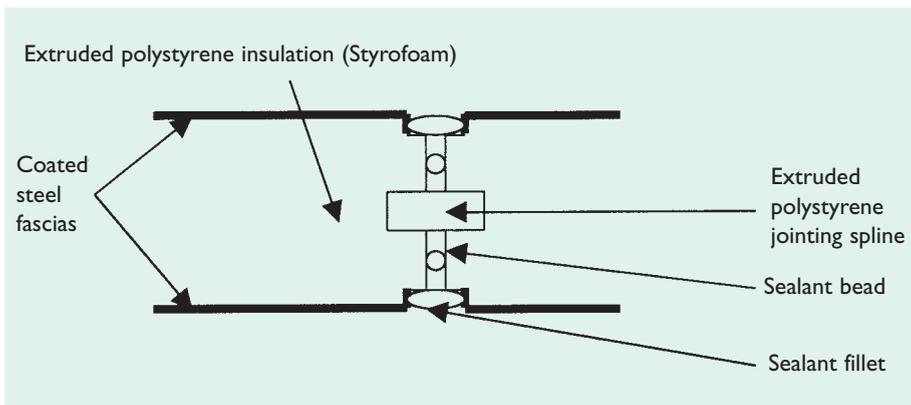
Cross section through a prefabricated insulation panel used in the Millennium Seed Bank. Diagram slightly exaggerated in order to show features.
